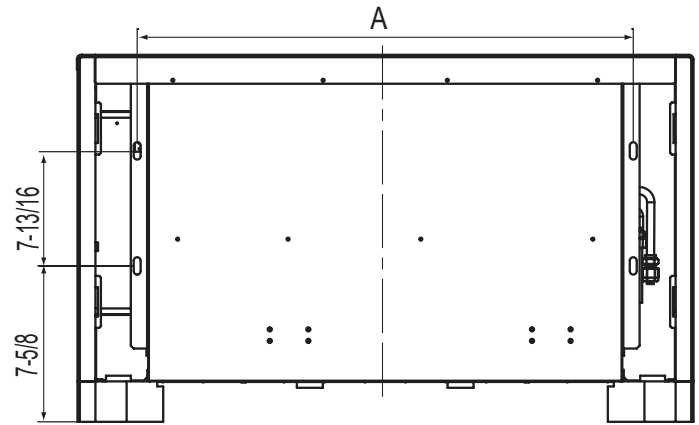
Floor Standing Indoor Unit with Gravity Drain and Down
